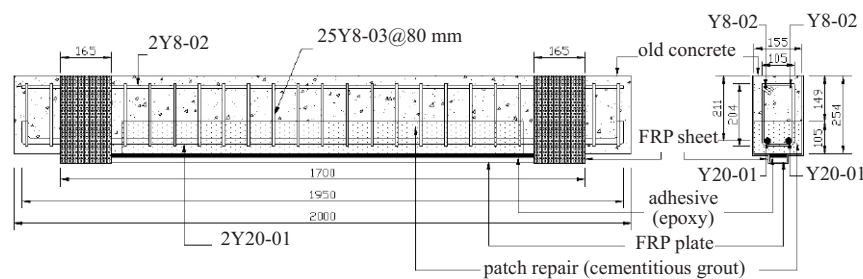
Reinforcement layout of a typical patch-repaired and CFRP-strengthened R.C. beam
